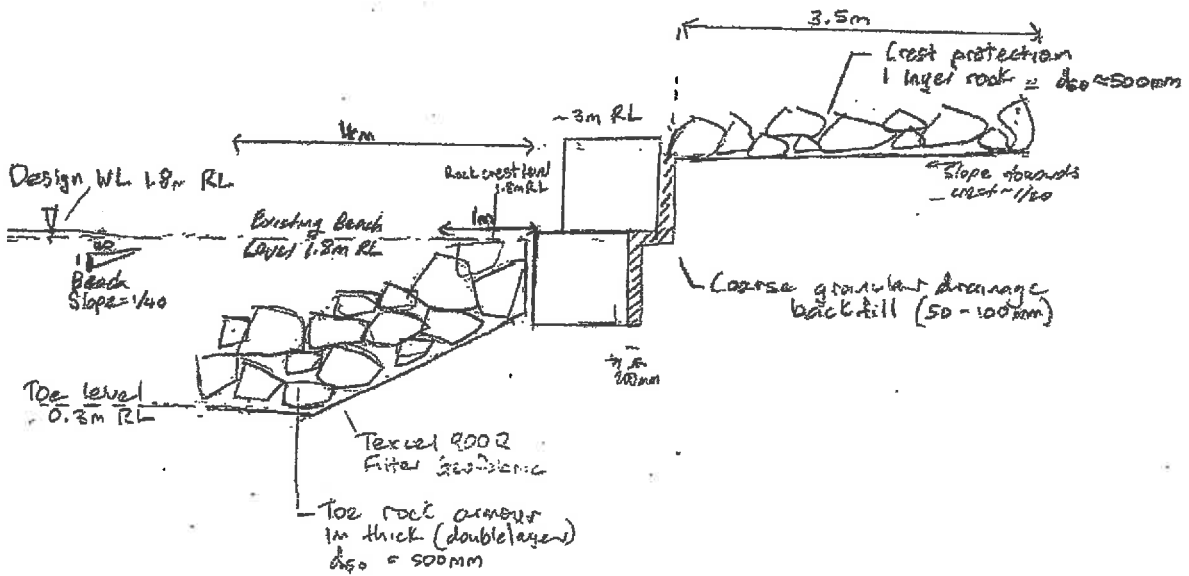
Sketch showing the arrangement of the proposed protection along the concrete block wall section of the seawall
